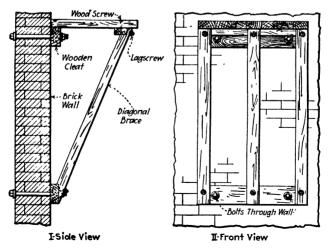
A wall bracket with a long diagonal brace to reduce the stress on the wall.
